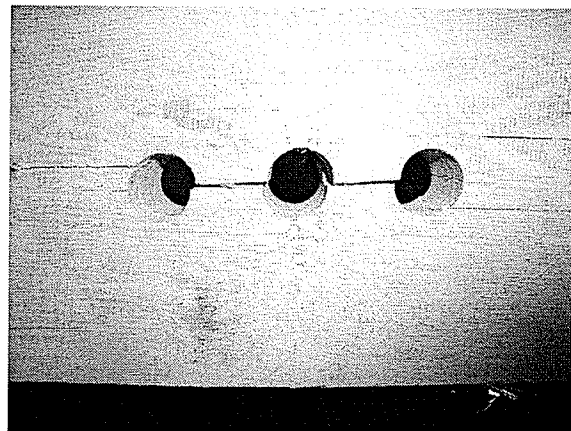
Shear Failure through Drilled Holes ($1B - D - 2$)
